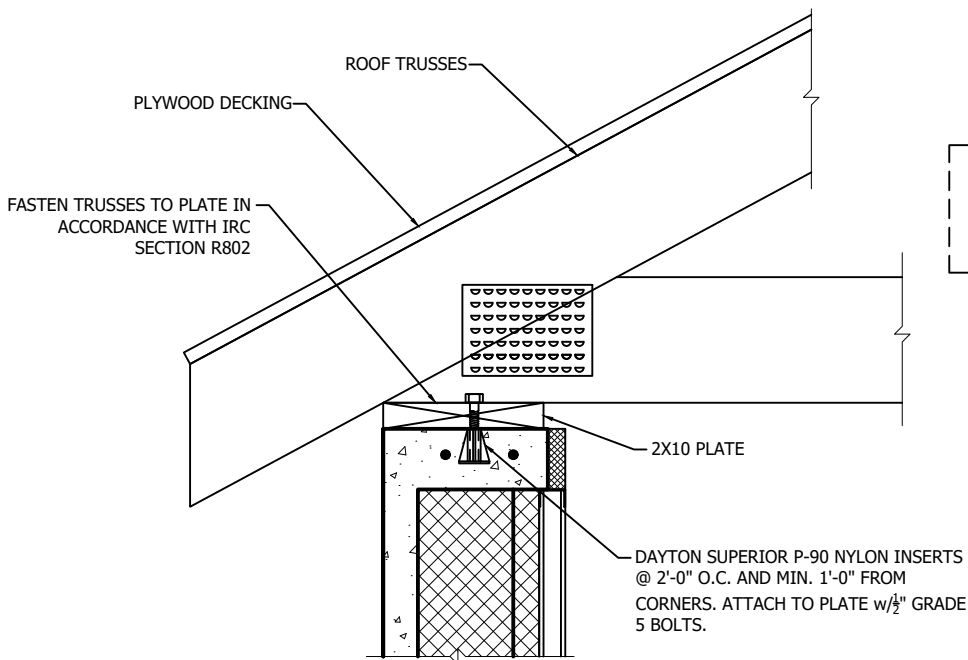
ROOF TRUSS PARALLEL TO WALL
